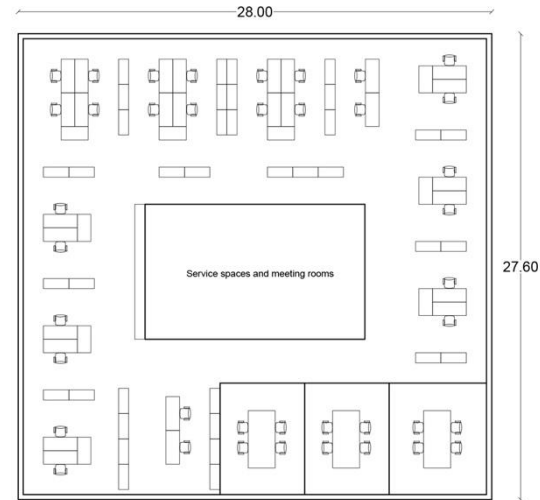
Architectural plan of a typical floor of the simulated building (measures in meters)
